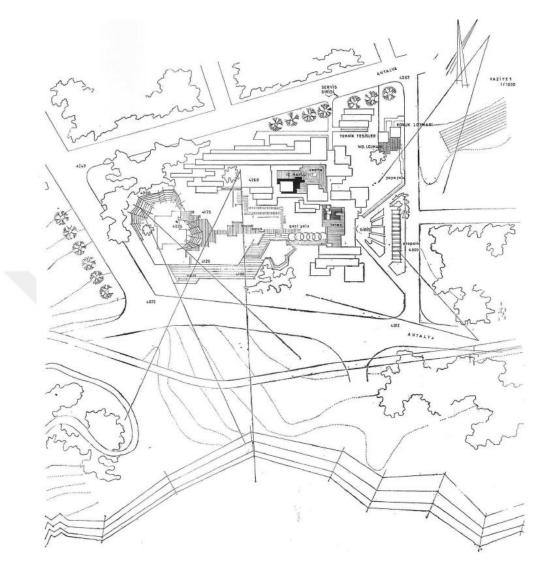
Site plan by Tekeli-Sisa Architects (Source: Arkitekt,1964/1)
